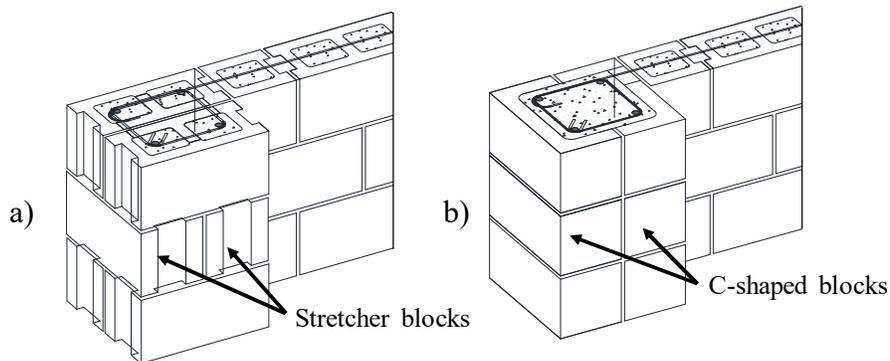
RCM Shear Walls with Boundary Elements Built using: (a) Stretcher Blocks; (b) C-Shaped Blocks
